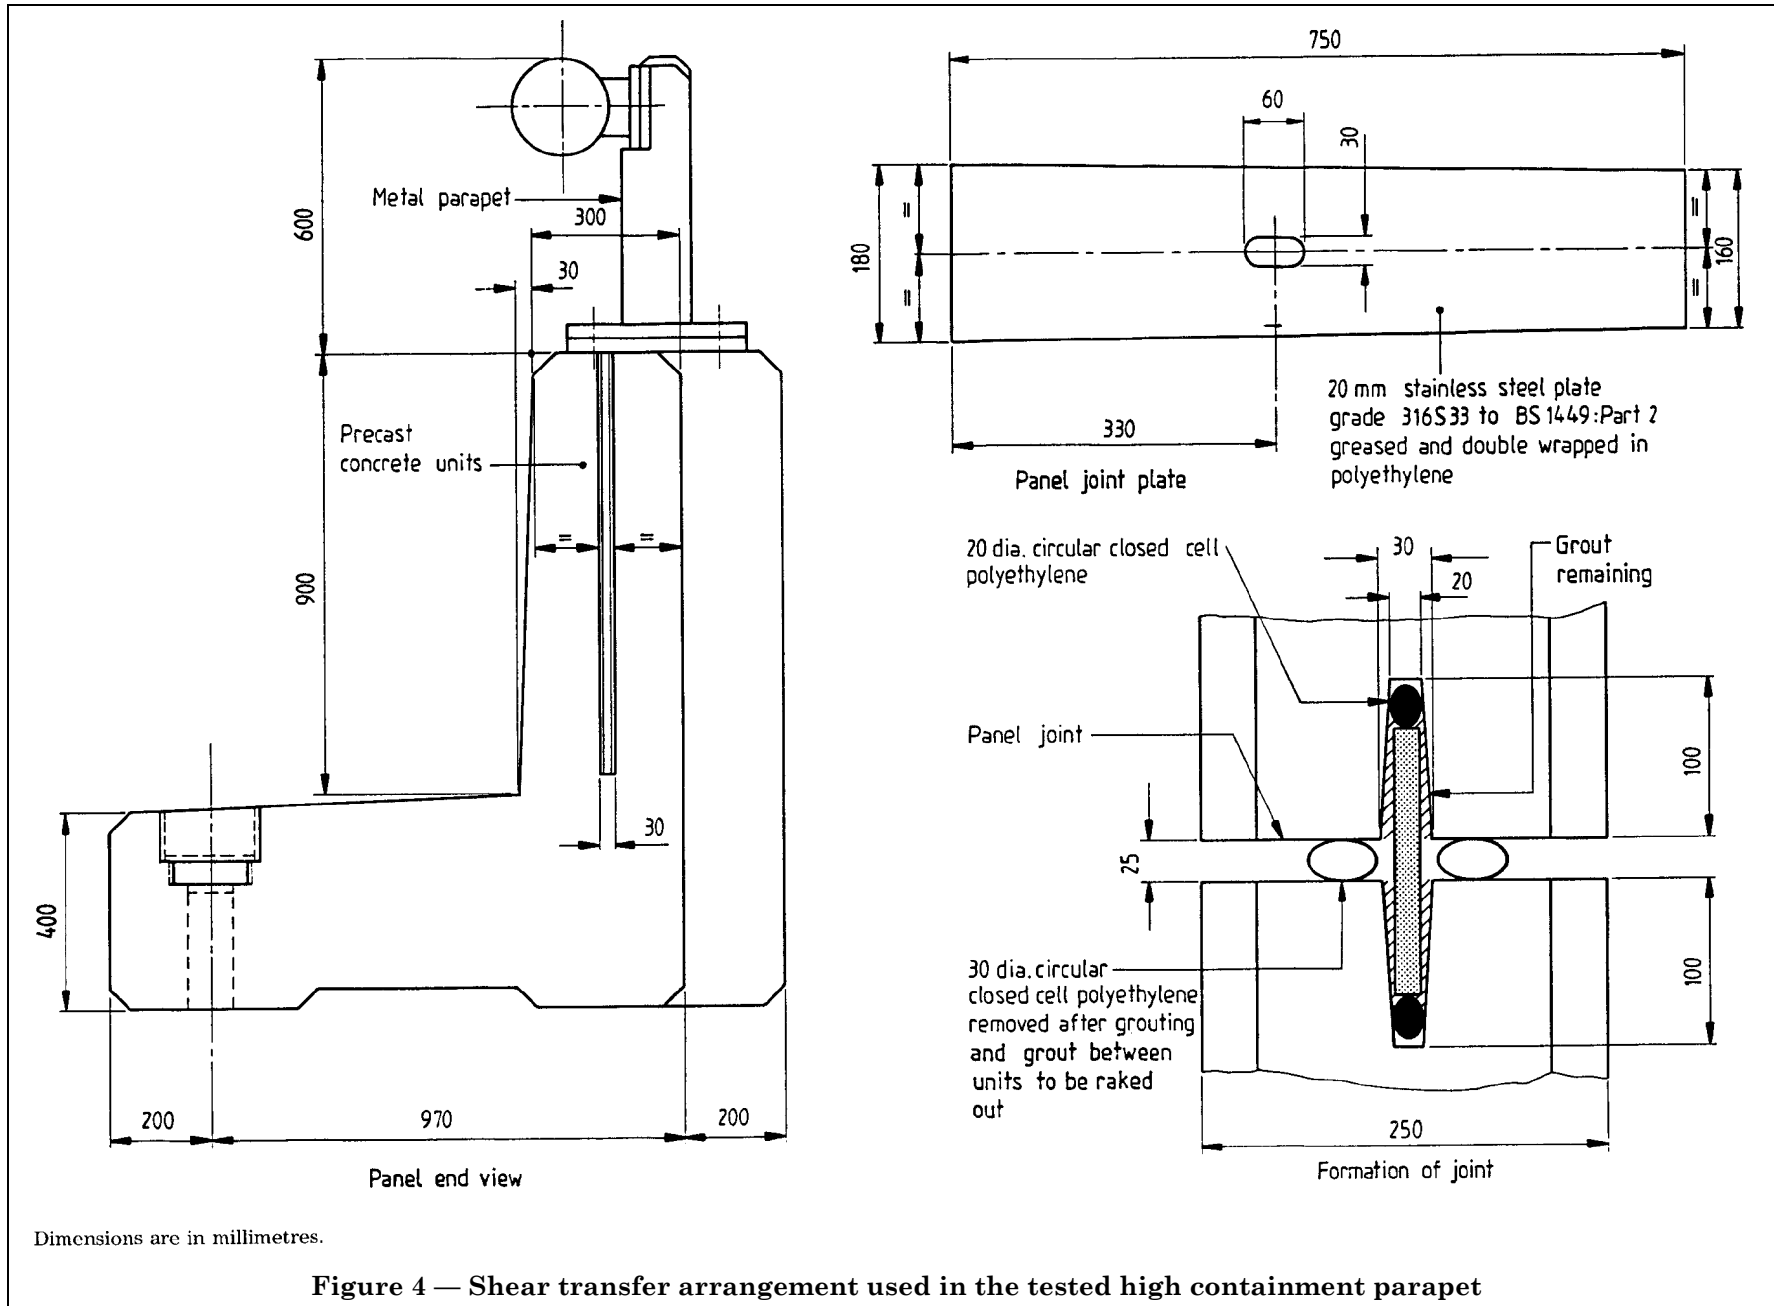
Shear transfer arrangement used in the tested high containment parapet
